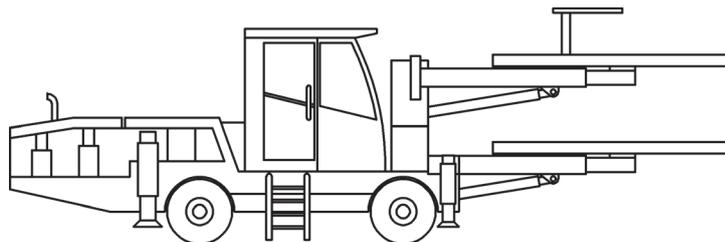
Rubber-tyred multiple boom rock drill rig for drilling blast holes underground
